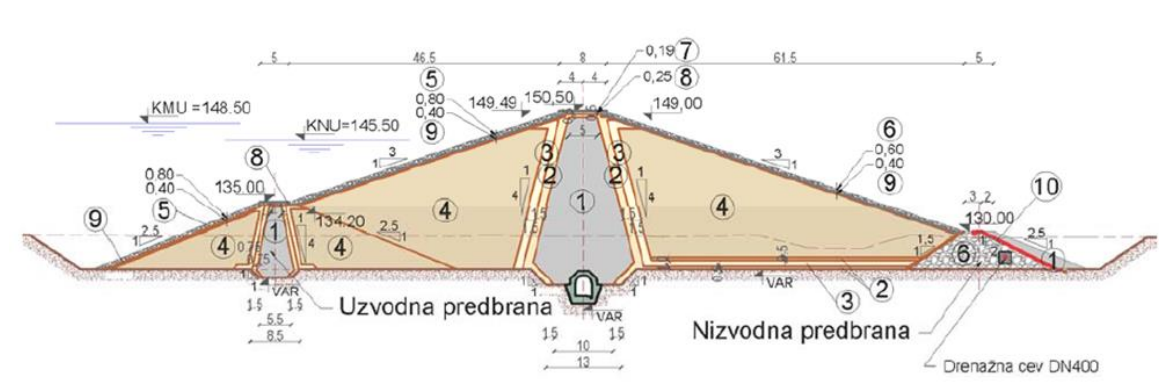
Typical cross section of Pambukovica Dam (Source – Design for Construction Permit)
